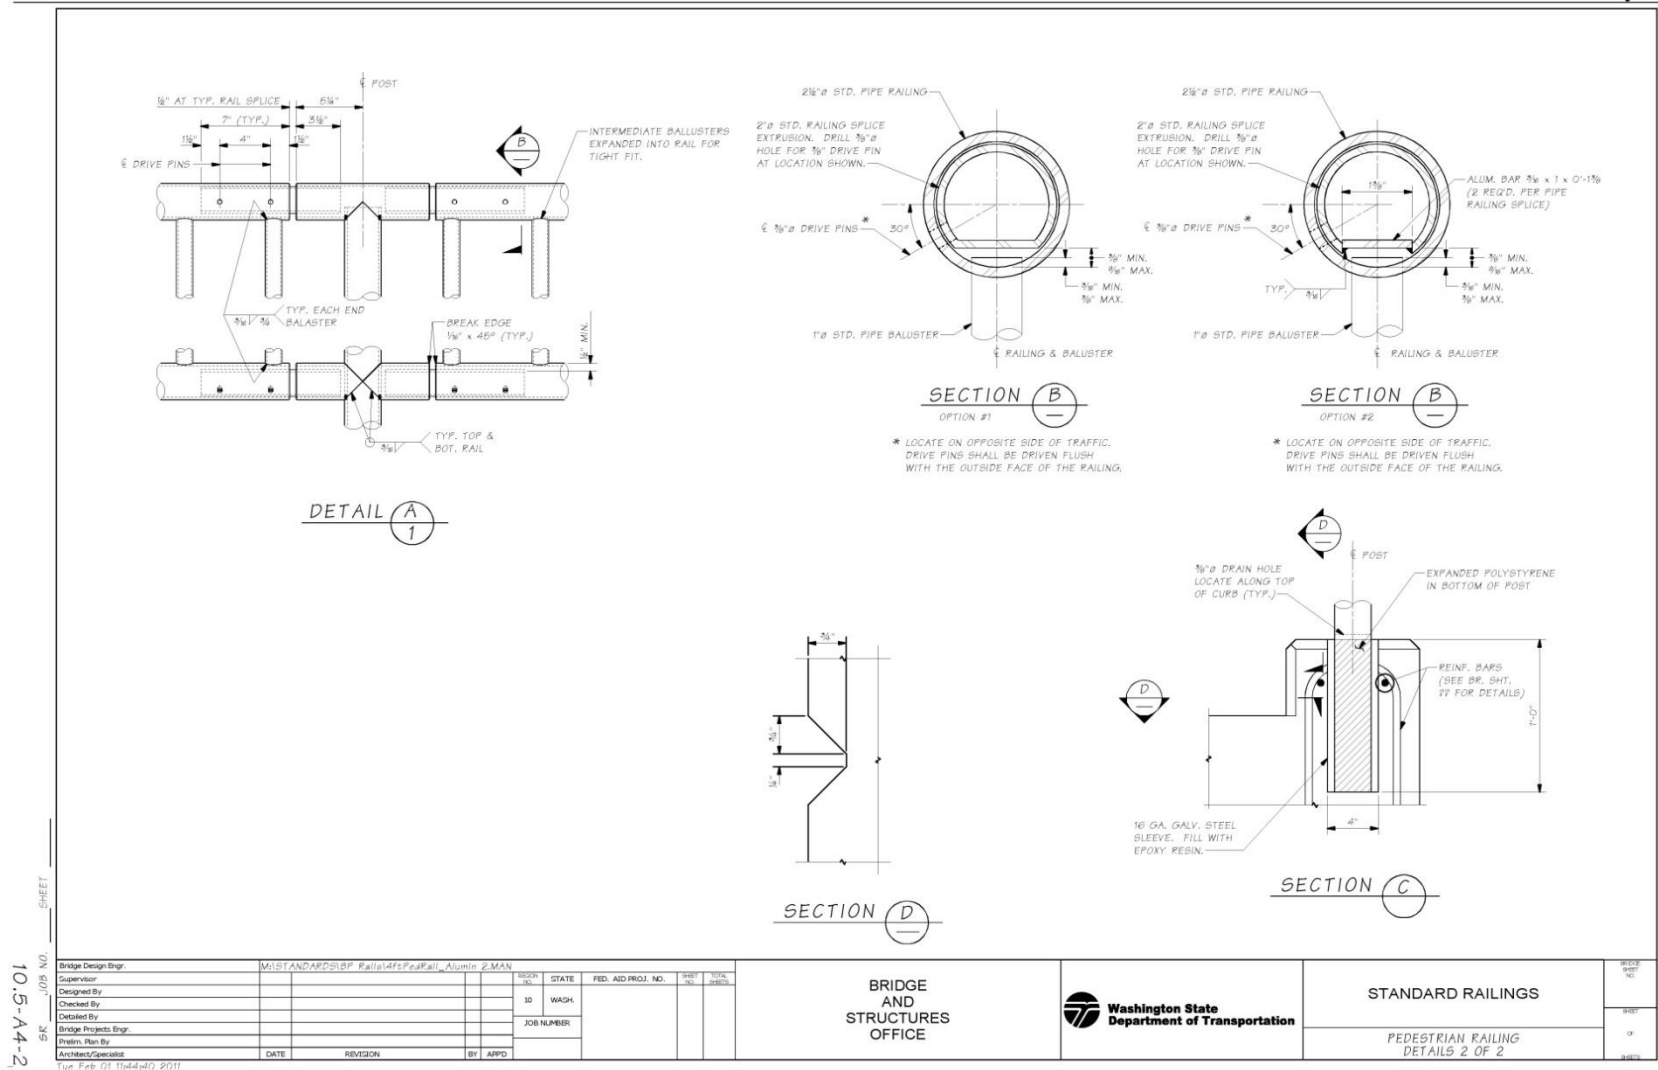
Washington DOT Standard Railing (Sheet 2 of 2) [29]
